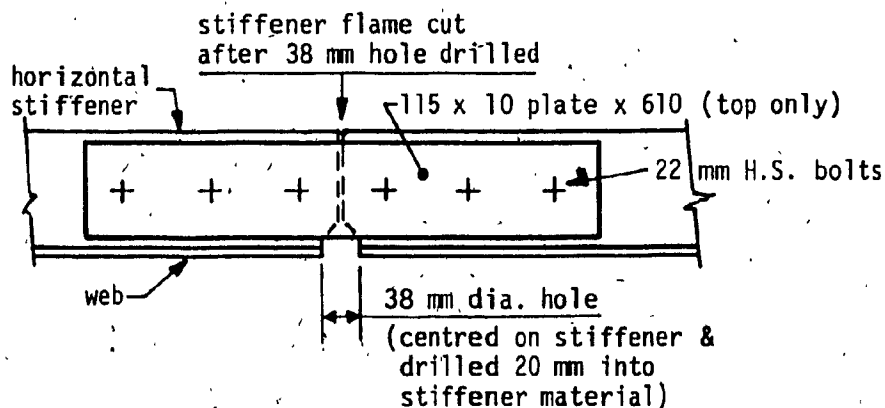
RETROFIT AT HORIZONTAL STIFFENER WELDED SPLICES
